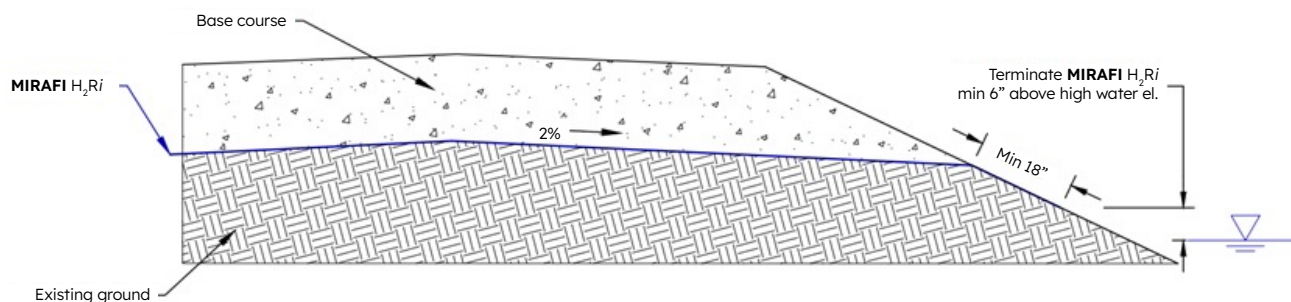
Embankment MIRAFI H₂Ri daylight into ditch detail
